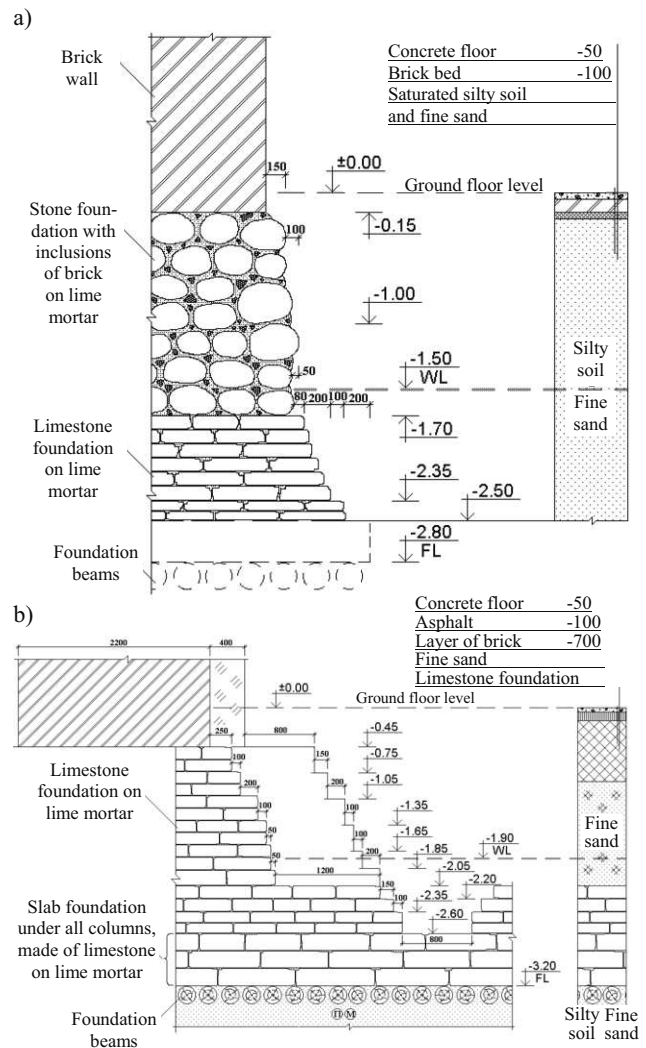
a) Exterior wall foundation of Stock Exchange stylobate; b) Foundations of Stock Exchange pillars
